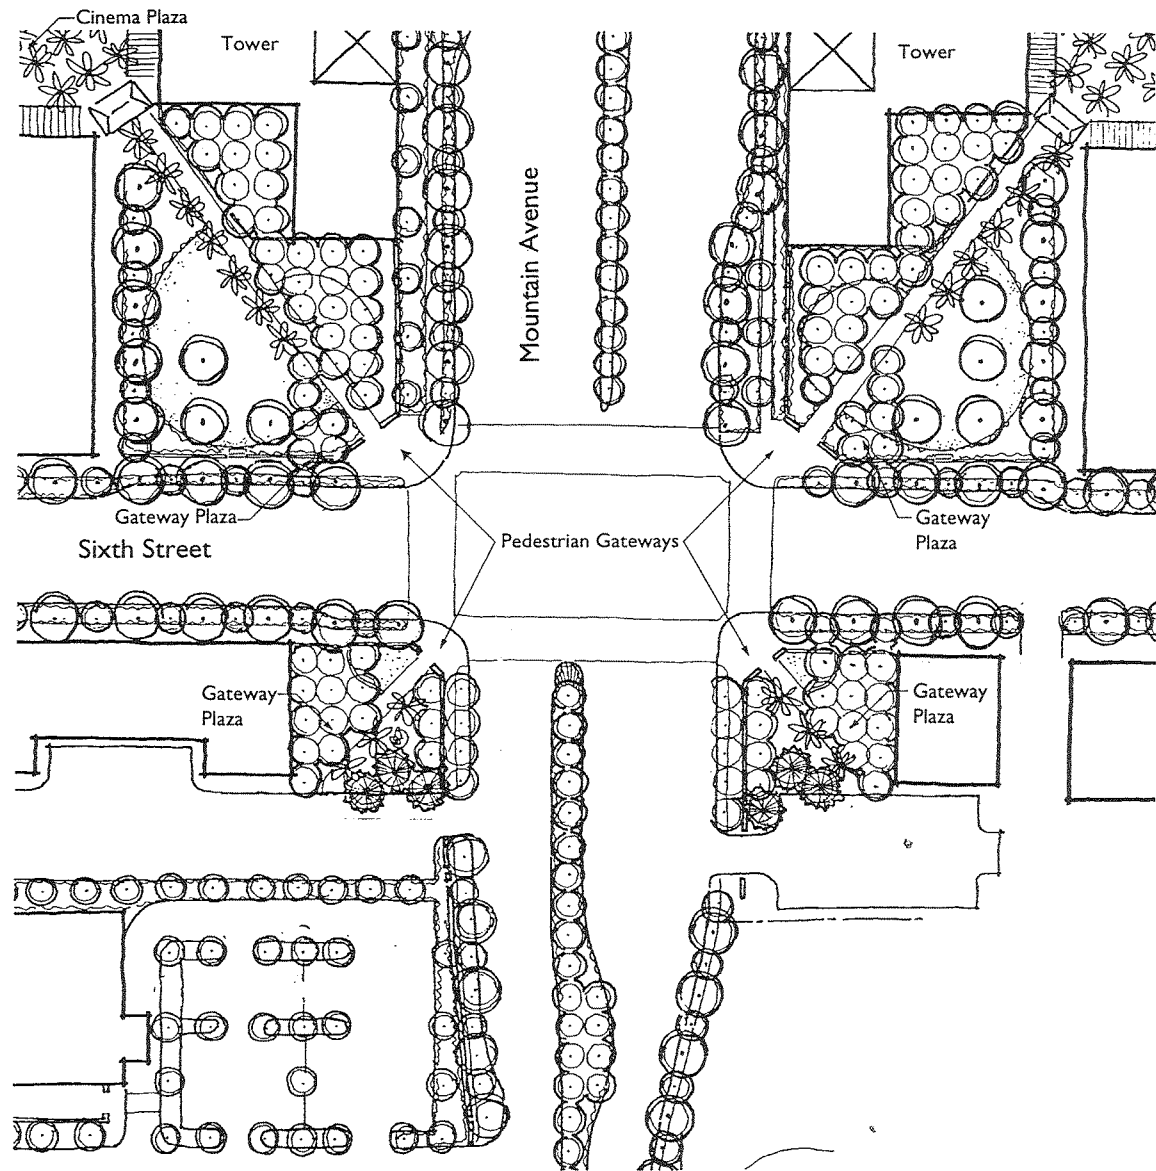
, Gateway Intersection. Two parks and two plazas face the prominent intersection of Mountain Avenue and Sixth Street.
